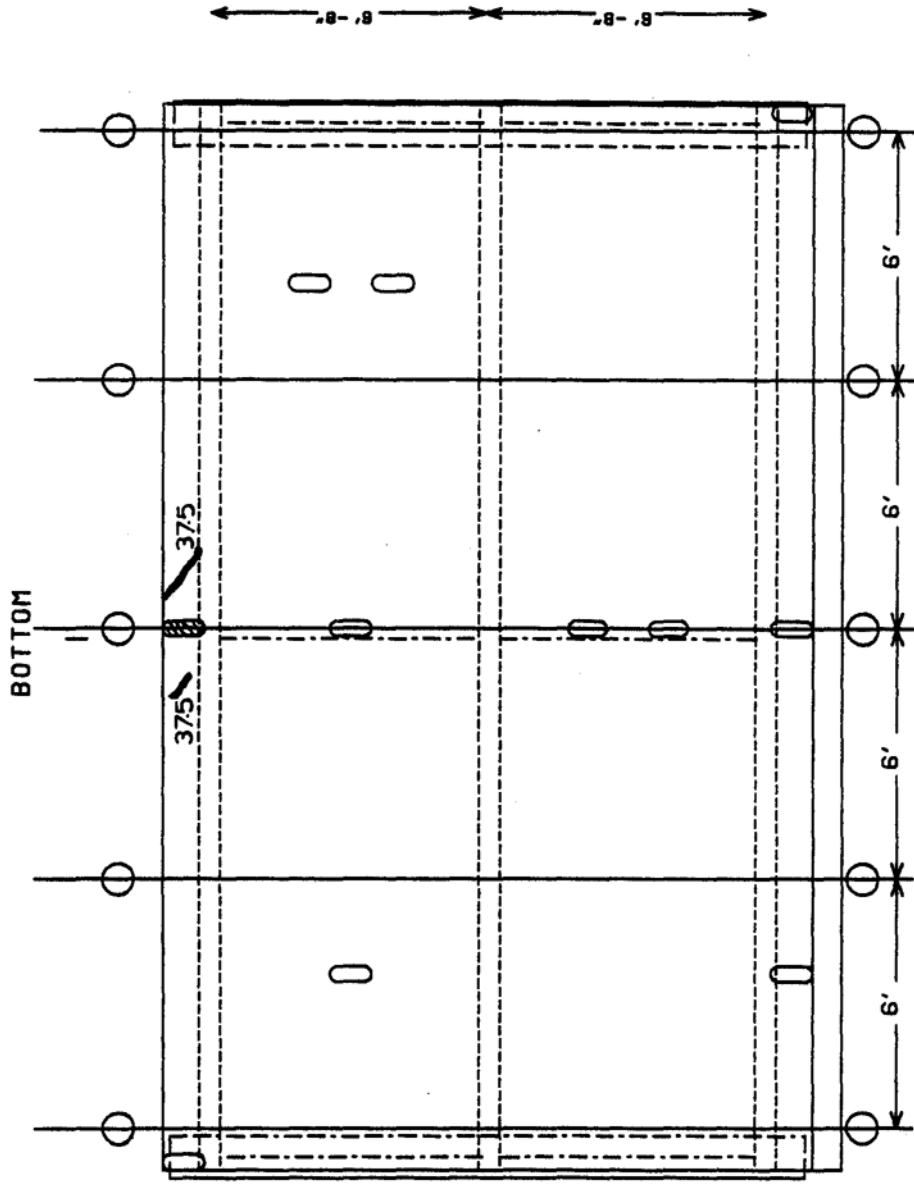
Bottom Cracking Pattern (First Bridge - Test No. 2)
